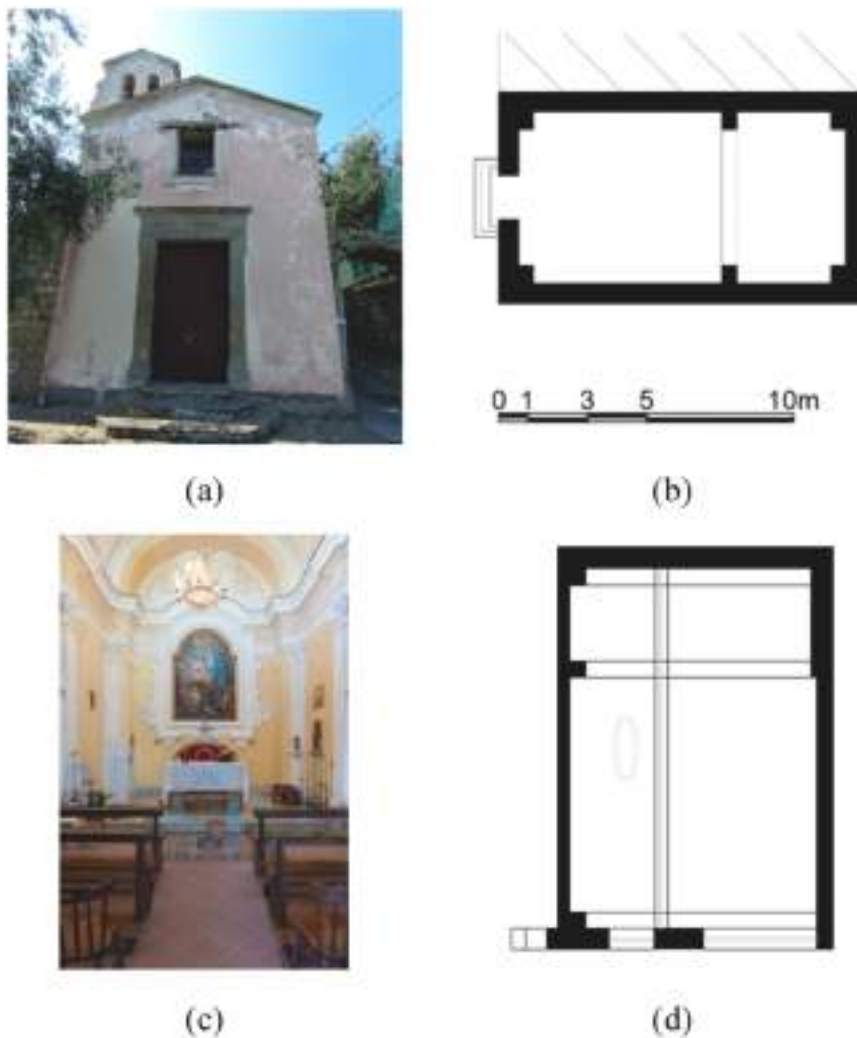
Photographic documentation of the church of Saint Maria della Purità: a) Main façade; b) Ground floor layout; c) Nave; d) Cross-Section.
